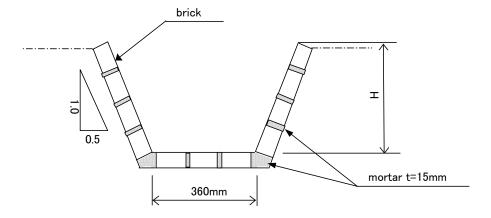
Standard Cross Section of Canal (B=0.34m, Trapezoid)
